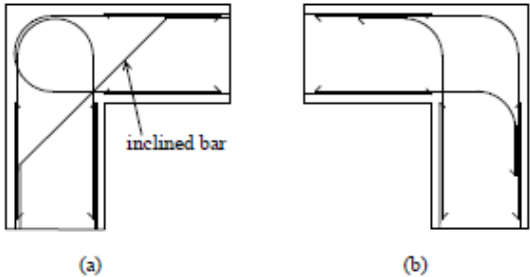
Reinforcement detailing with spliced bars (inclined bar for opening moment) (a) and the conventional reinforcement detailing (b) (Johansson, 2000).
